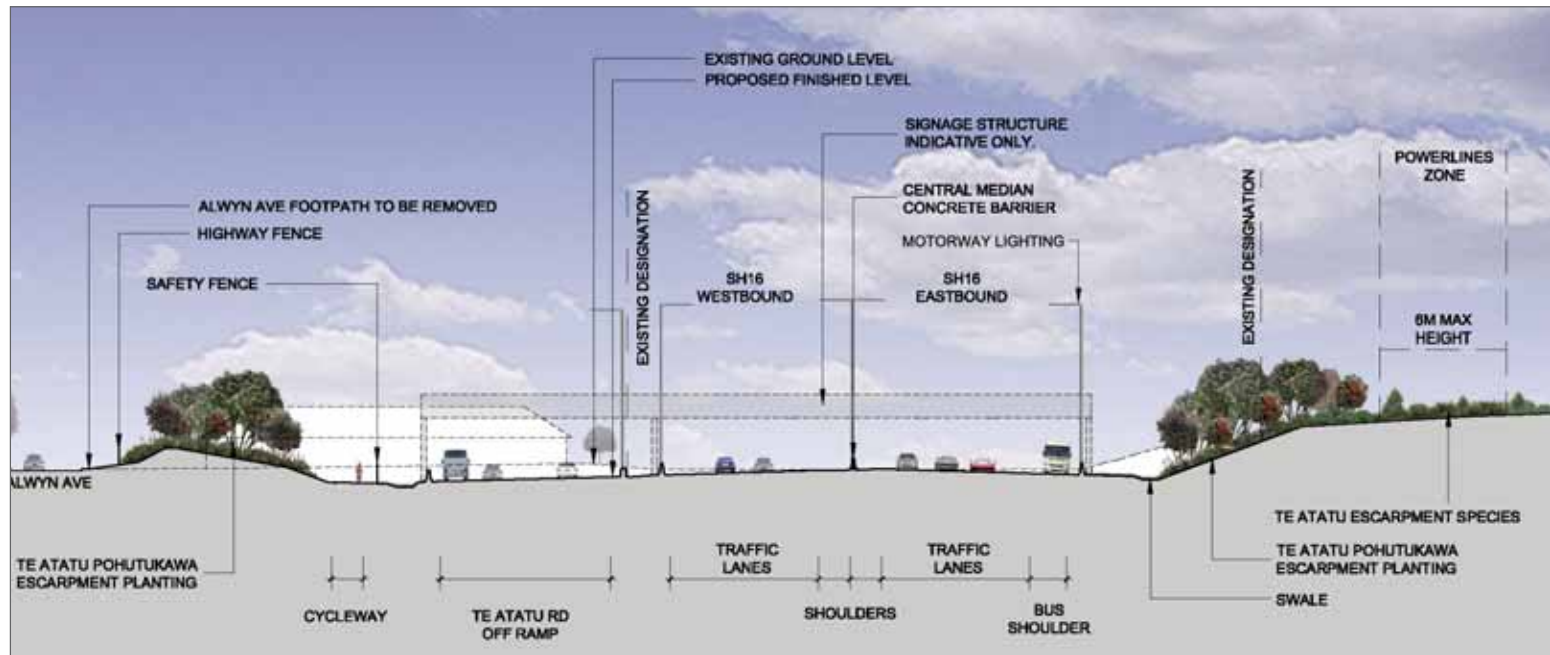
Future cross-section at Te Atatu westbound off-ramp compared with existing arrangement
